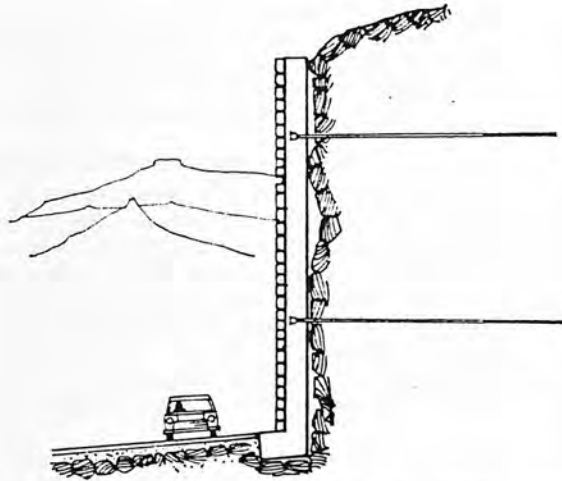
Revetment of rock with anchored retaining walls: permanent works
